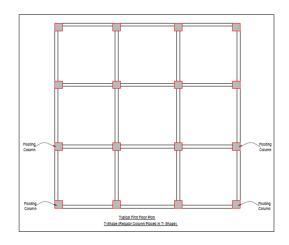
Typical First floor plan of T-shape (With Floating Column)
